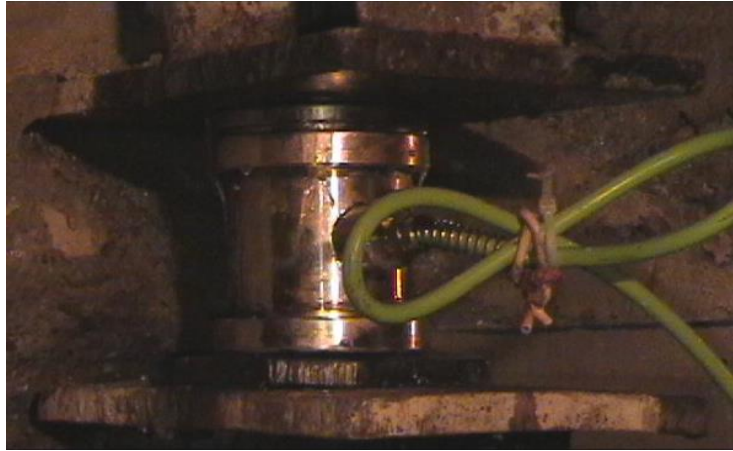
Load cell on the steel rib at crown of powerhouse
